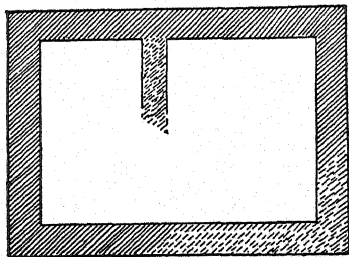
PLAN OF TOWER AT ERGANOS.
